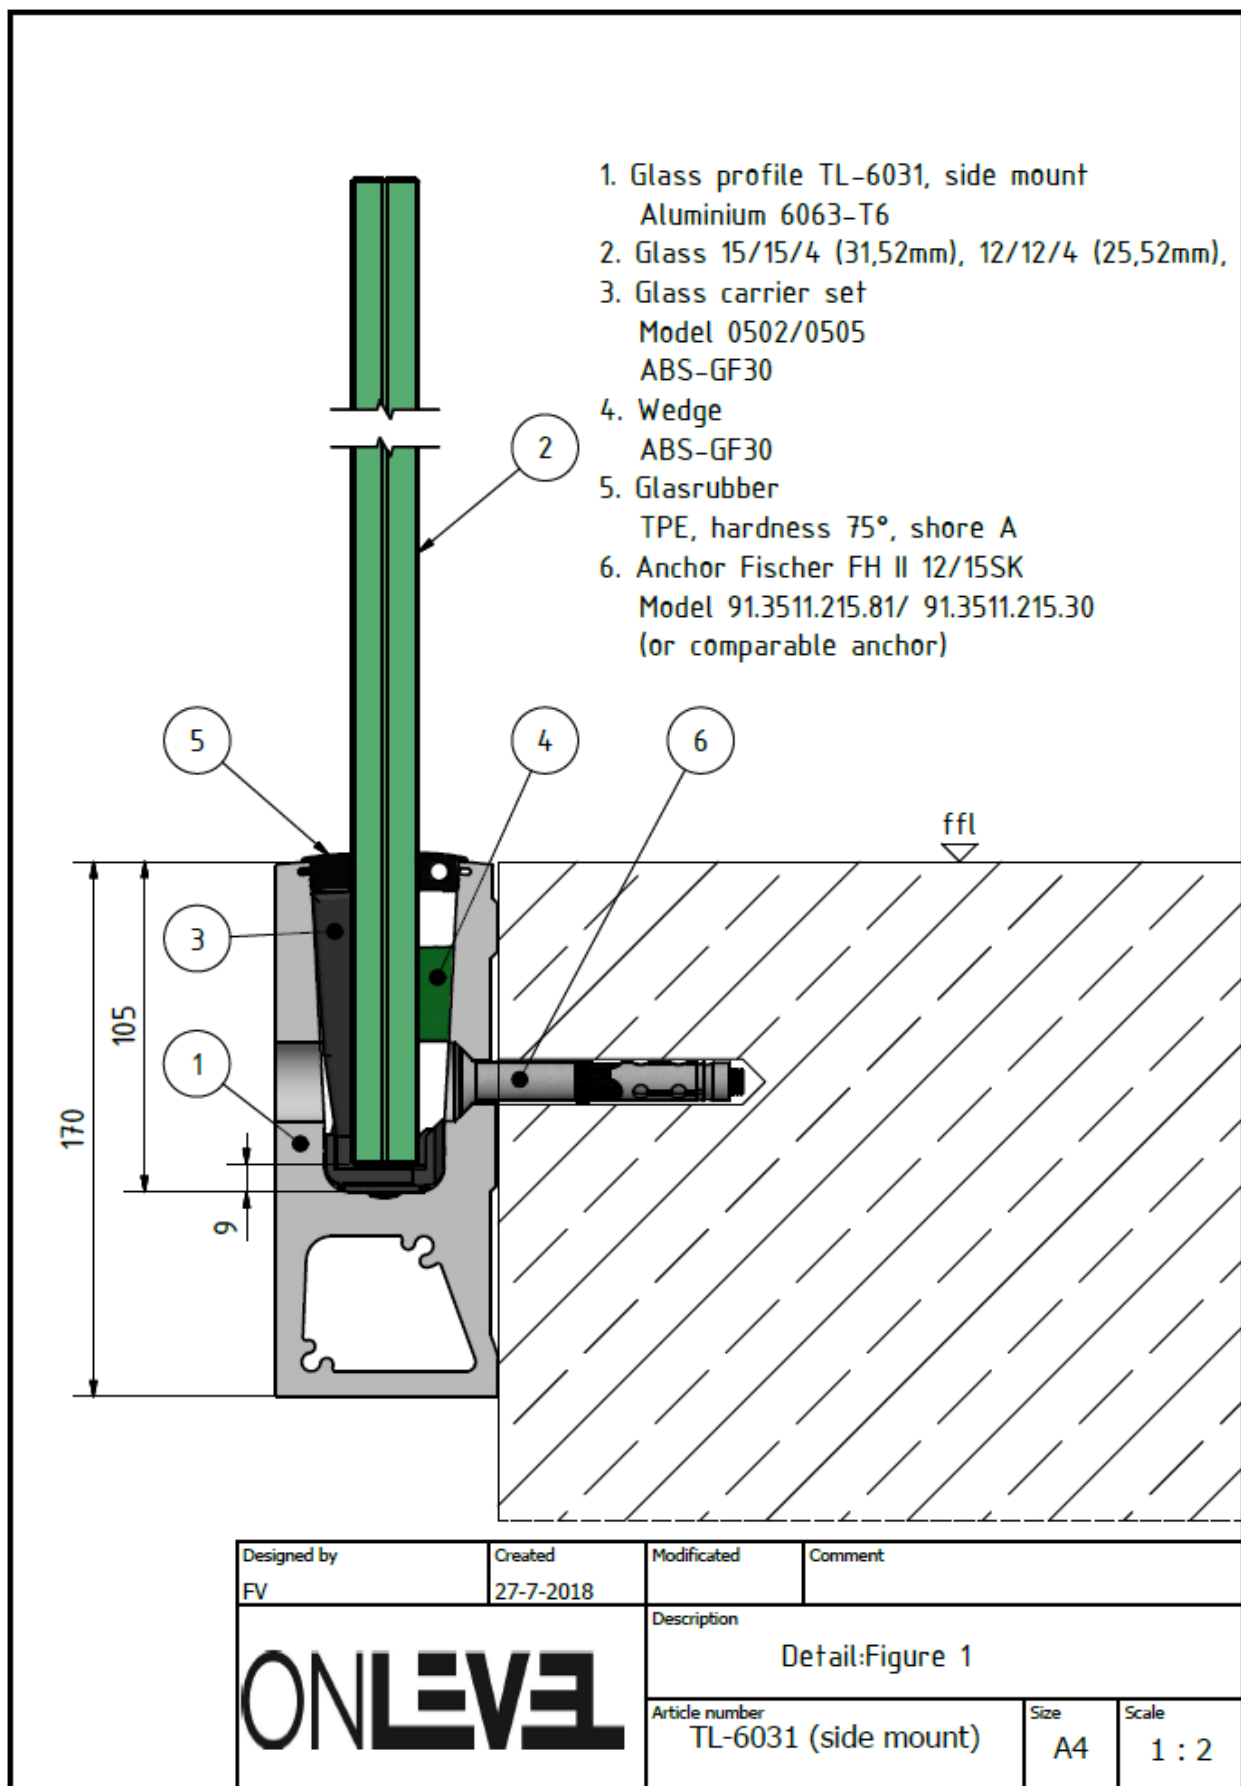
21. Product drawing from OnLevel for profile 6031 Side Mount – 3.0 kN/m, sheet 1 of 4.
